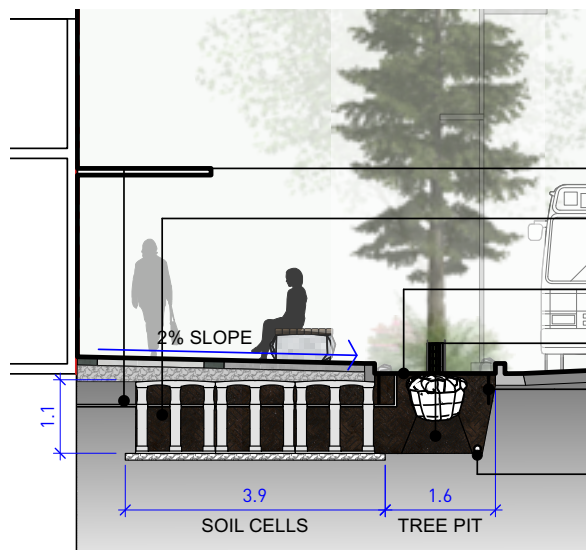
ENLARGEMENT 2 - LAYOUT AND PAVING 'A'
